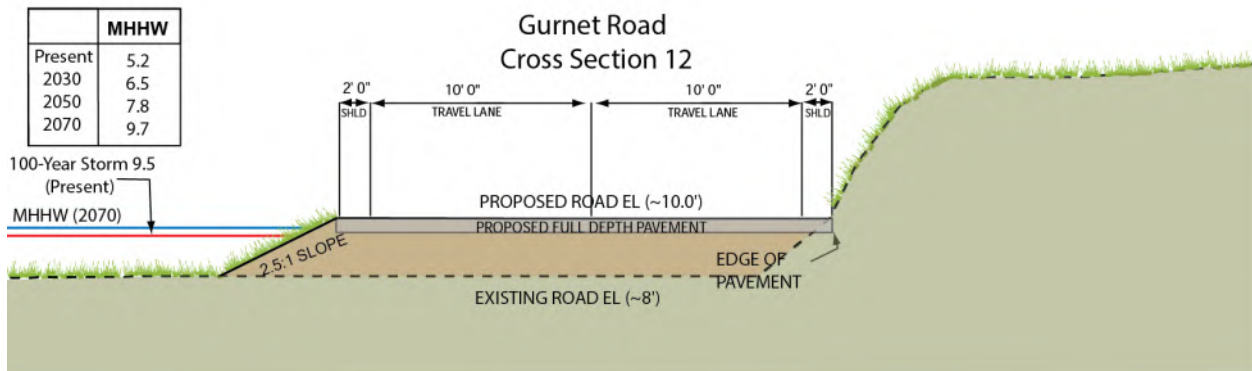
Gurnet Road adaptation plan at Cross Section 12
